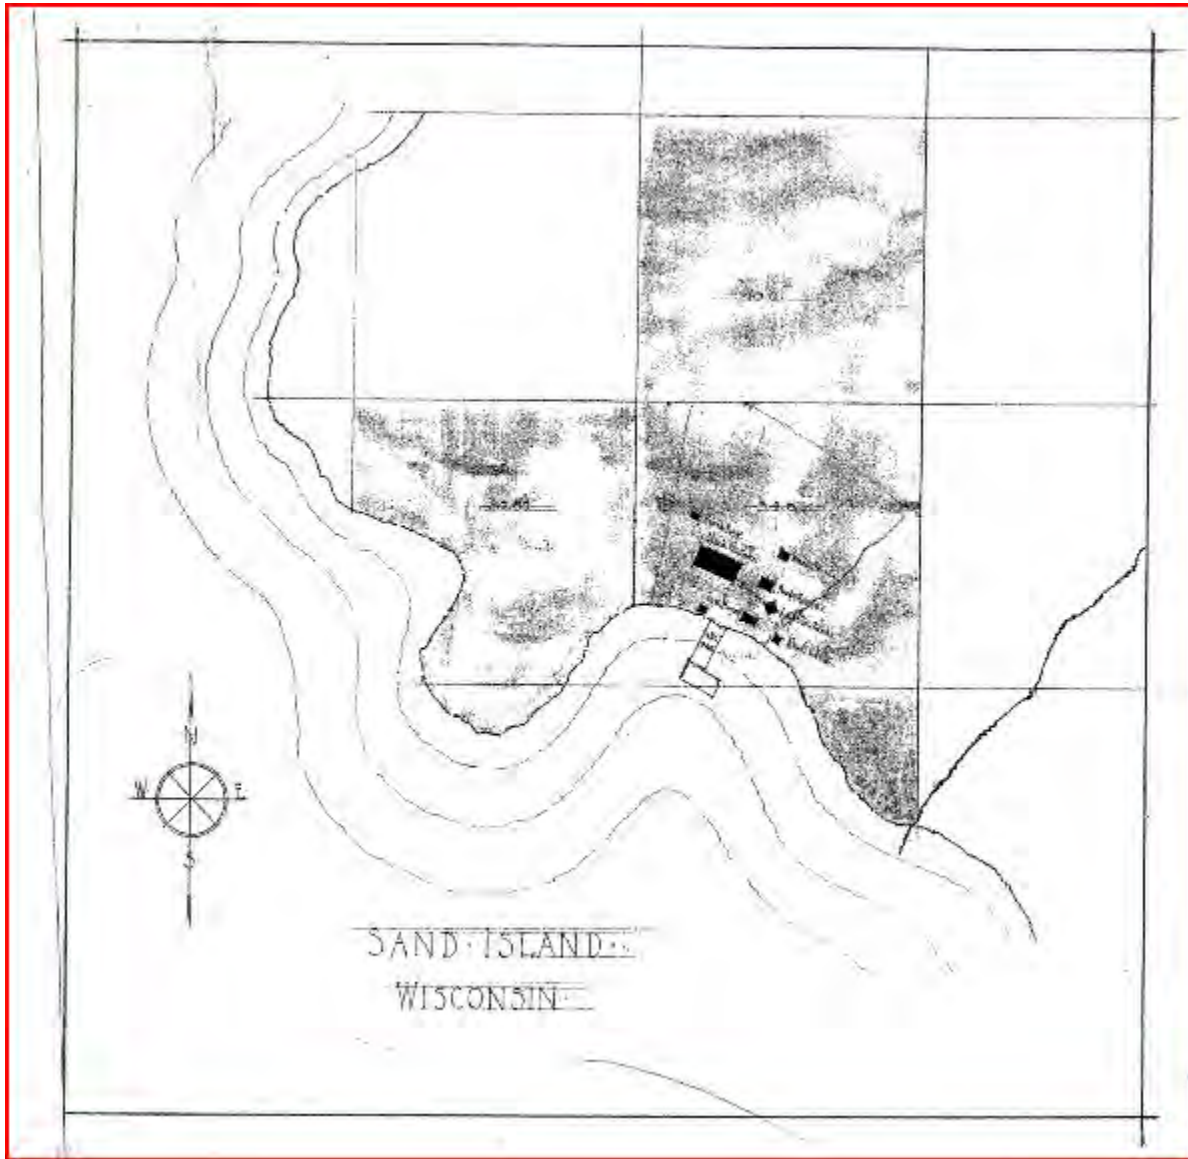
1912 Proposed Site Plan for the West Bay Club, Buechner & Orth drawing
